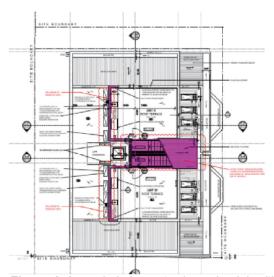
Amended elements shown in pink within the existing approved building footprint.
